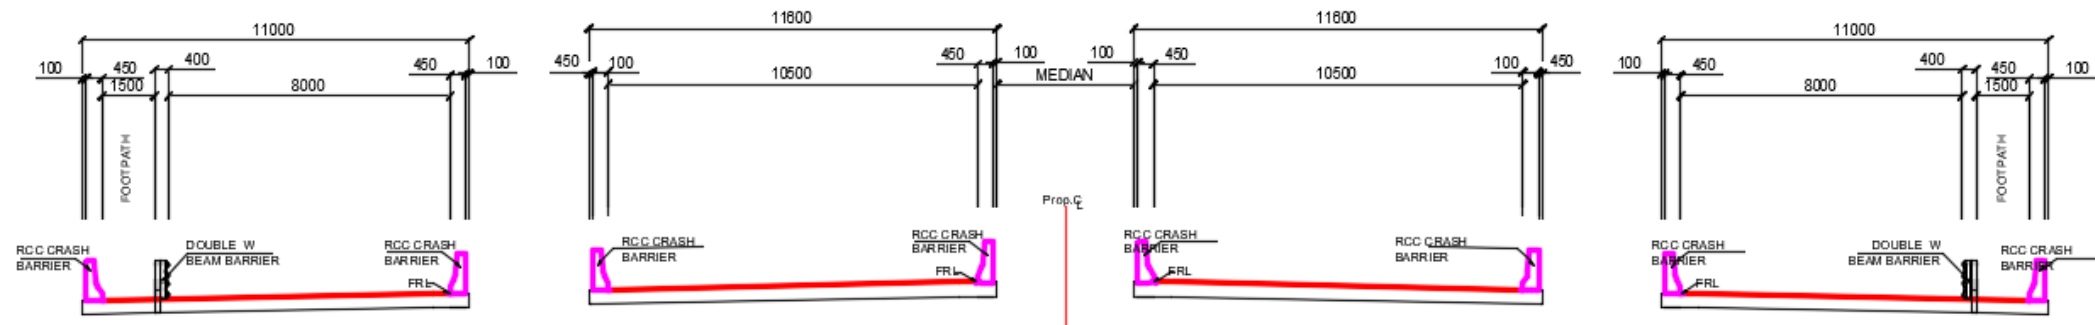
4-Lane Bridge at Deck Level with Service Road and Footpath (TCS-17)
